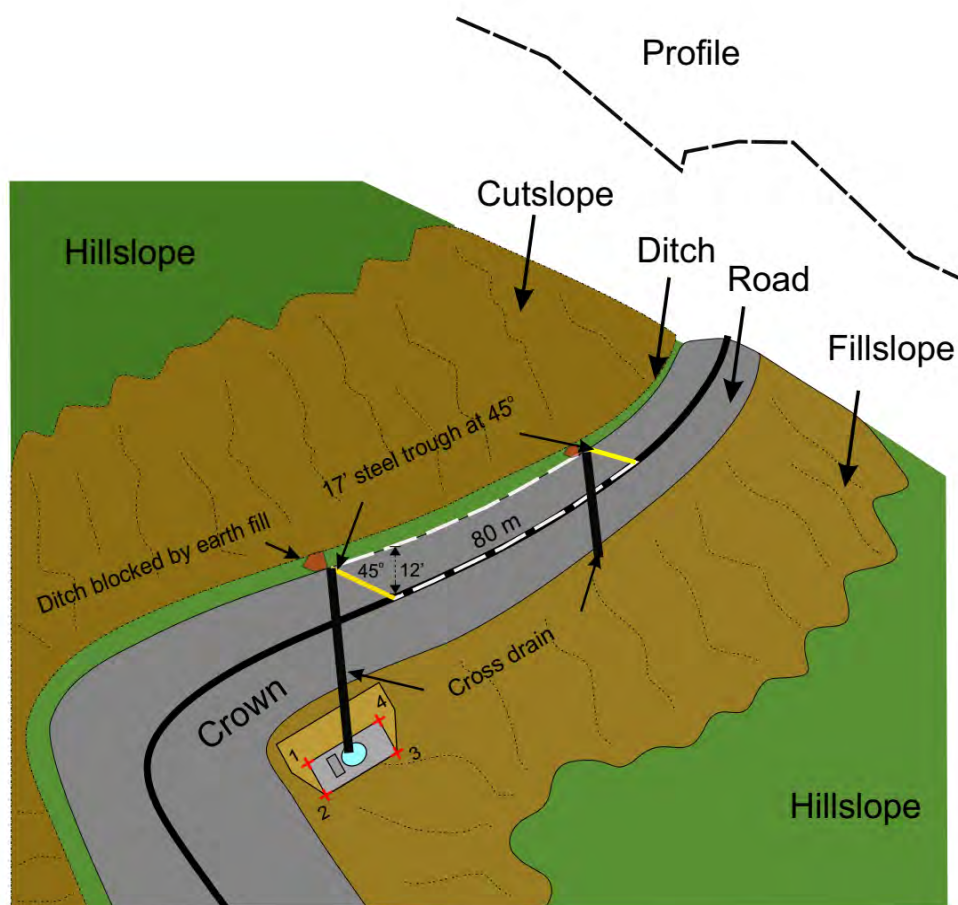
Configuration of an 80-meter segment. Ditch (in light green) is blocked below cross-drain culvert by earthen headwall. Steel trough is 5.2 m-long and placed on a 45-degree angle up the road to capture 3.66 m of the crowned road tread and drain into the ditch line .3 m above the cross-drain culvert inlet. The cross-drain culvert is on a strong skew to create a 5% gradient in the pipe, and it extends several feet beyond the edge of the tread to a platform that holds the sediment tub, tipping bucket and SST.
